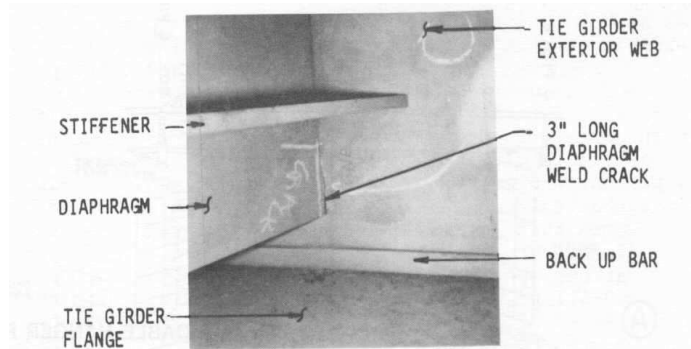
Distortion-induced Fatigue Crack (Courtesy of John M. Kulicki)
